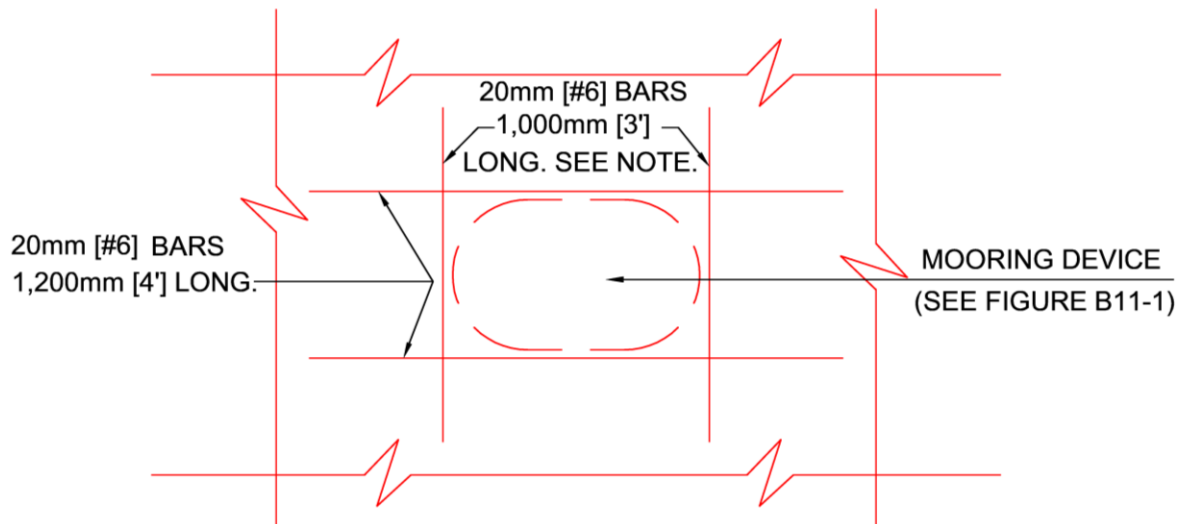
Army Rotary-Wing Mooring Points Layout
